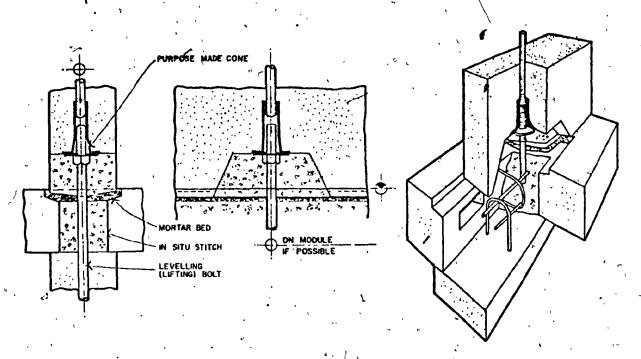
R-W Typical Internal Crosswall-To-Floor Joint (Ref. 31)
